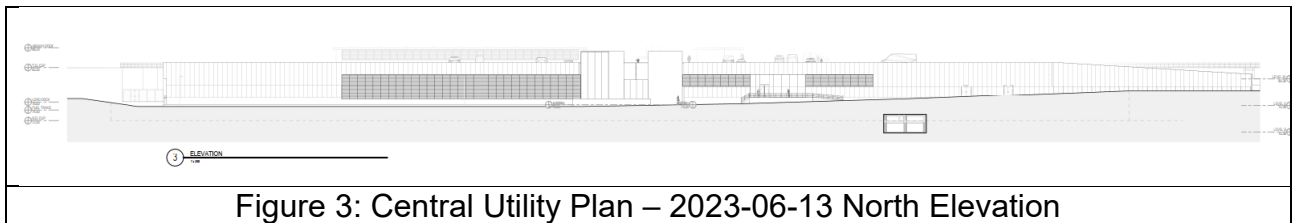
Central Utility Plan – 2023-06-13 North Elevation
